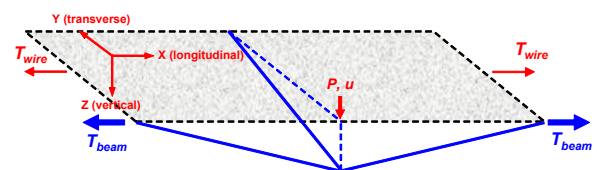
Simplified analytical model for deformed shape of floor slab under column removal scenario
